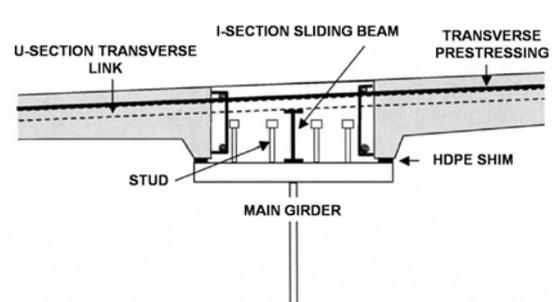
Connection conditions during construction for cantilevers and central section adopted up to 2005
